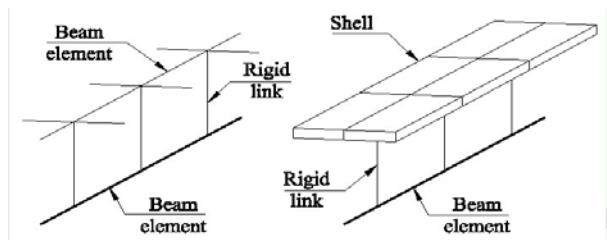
Discretization of girder by upstand grillage members and finite elements (3-D models).
